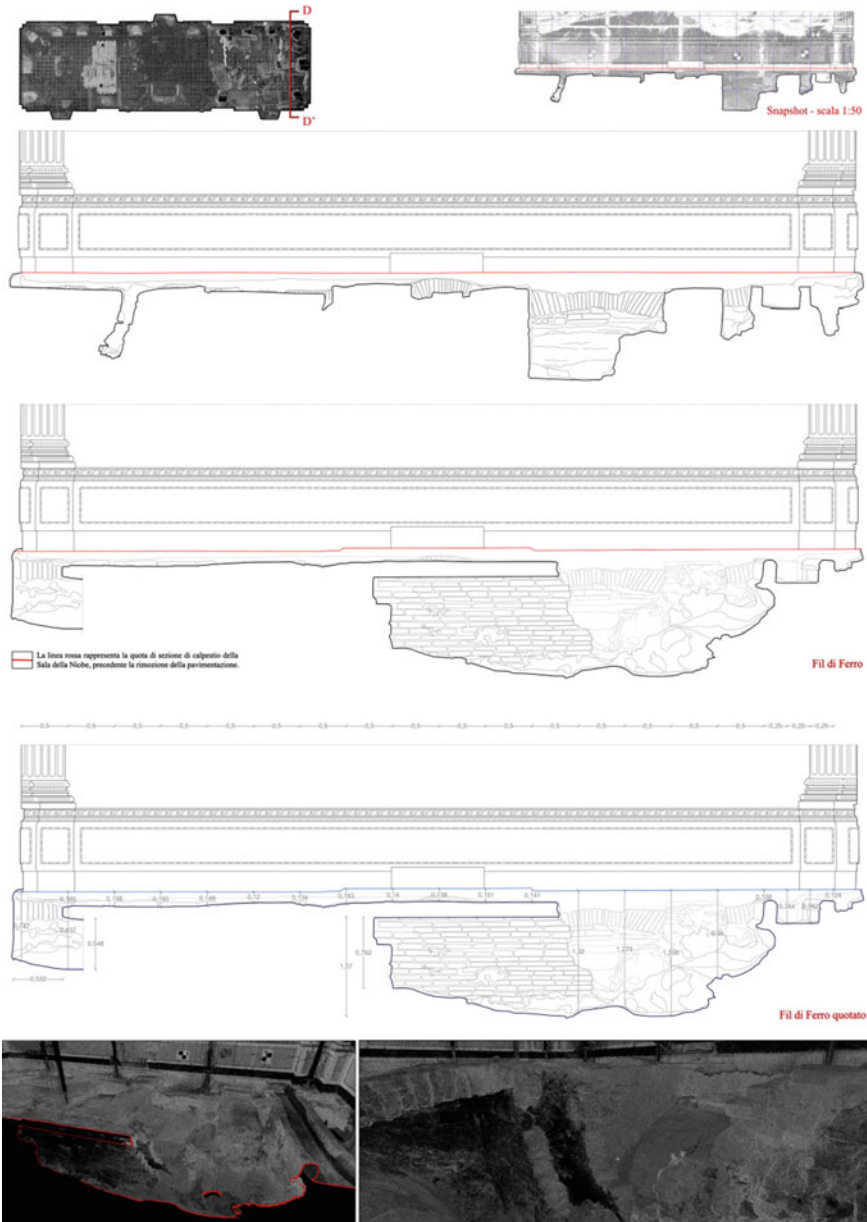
Details of the graphic restitution: point cloud, wire frame drawing, photomap reconstruction
